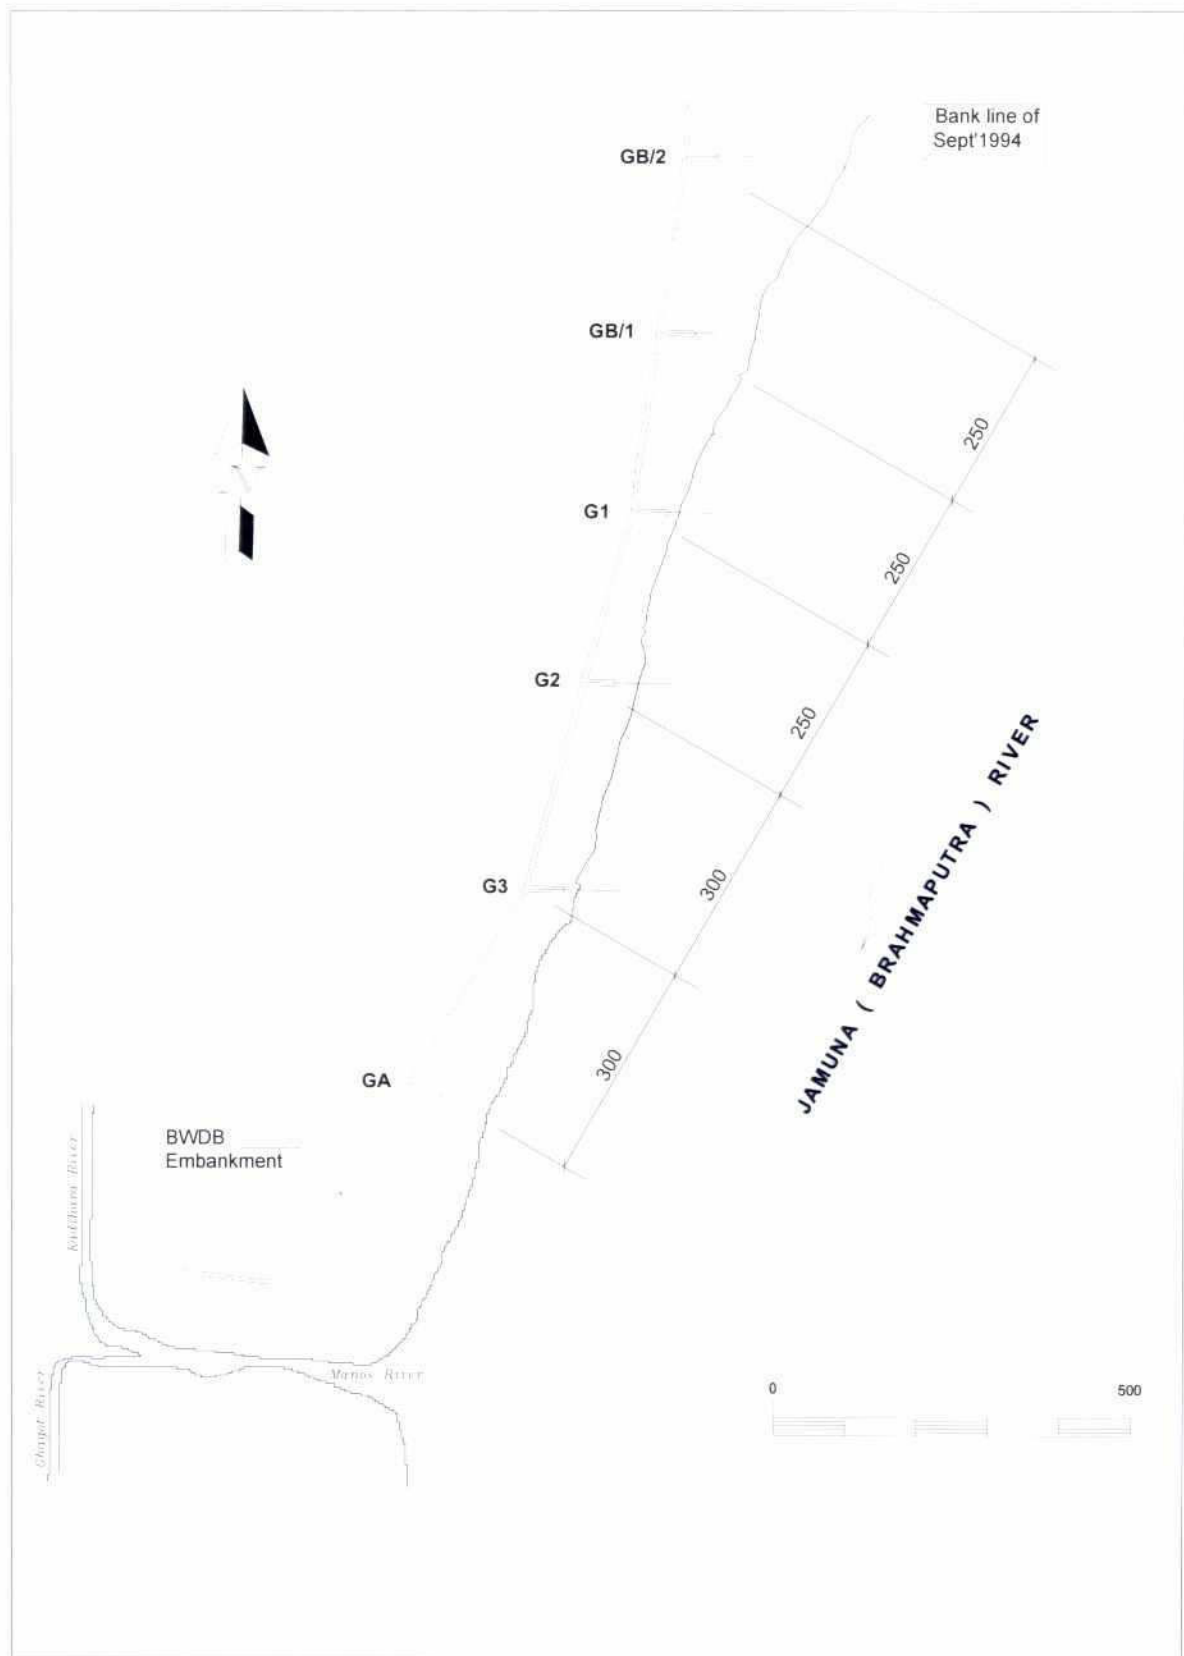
General Layout of Groyne Field – Test Site I
